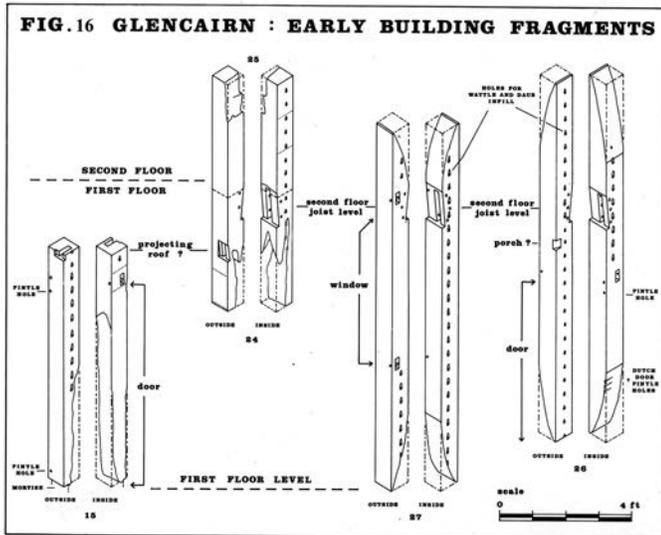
Glencairn, Dutch-framed Timbers Found in Stone Wing Floor and Frame Wing Garret
